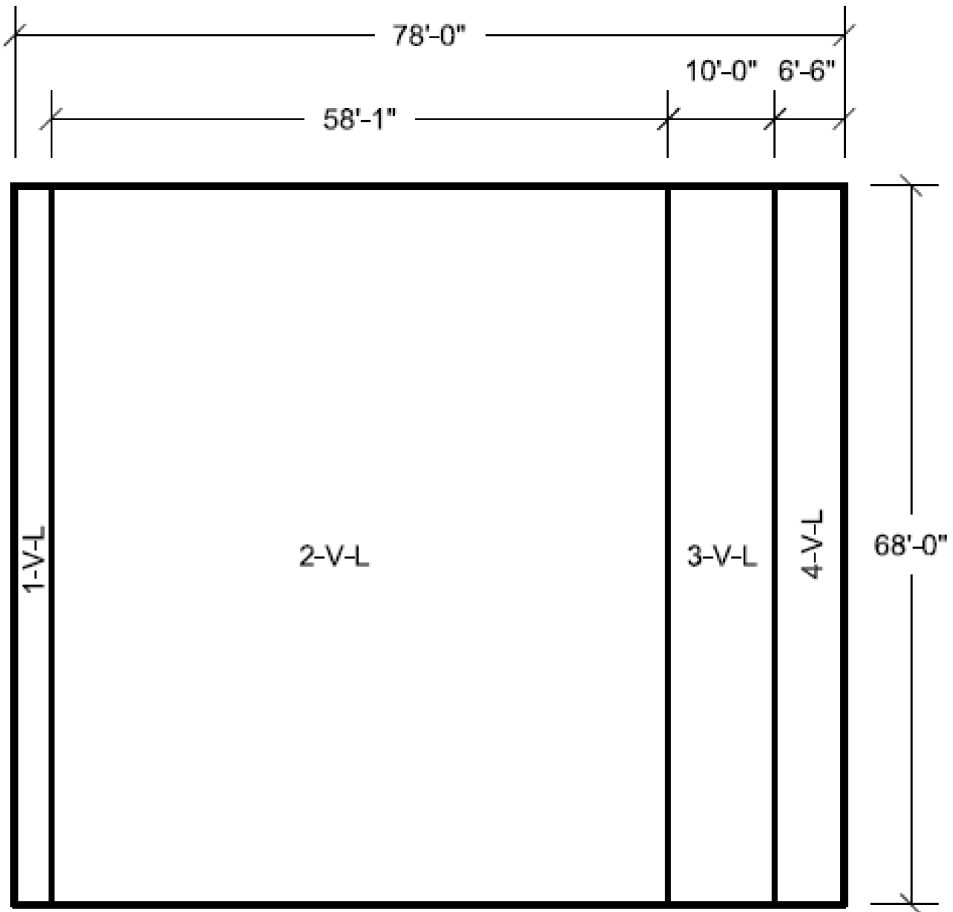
H.6-69 Pump House West Wall Looking East Vertical Reinforcement Zones Far Side Face
